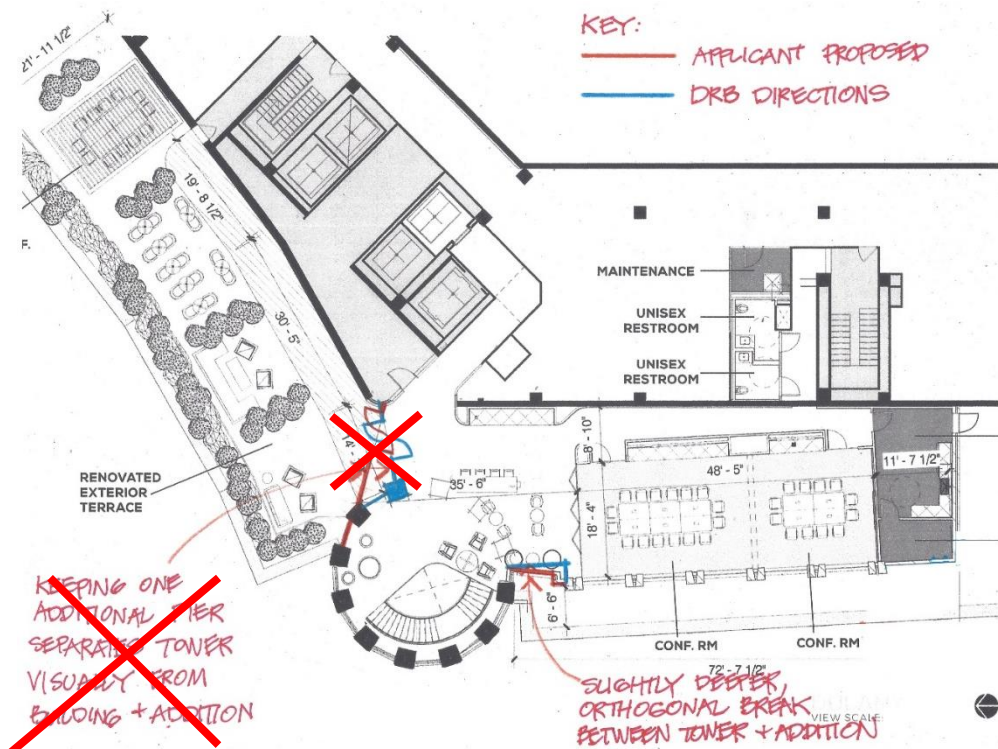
/Attachment #7: Illustration of DRB Recommendation (with Planning Commission Recommended Amendment in red)
